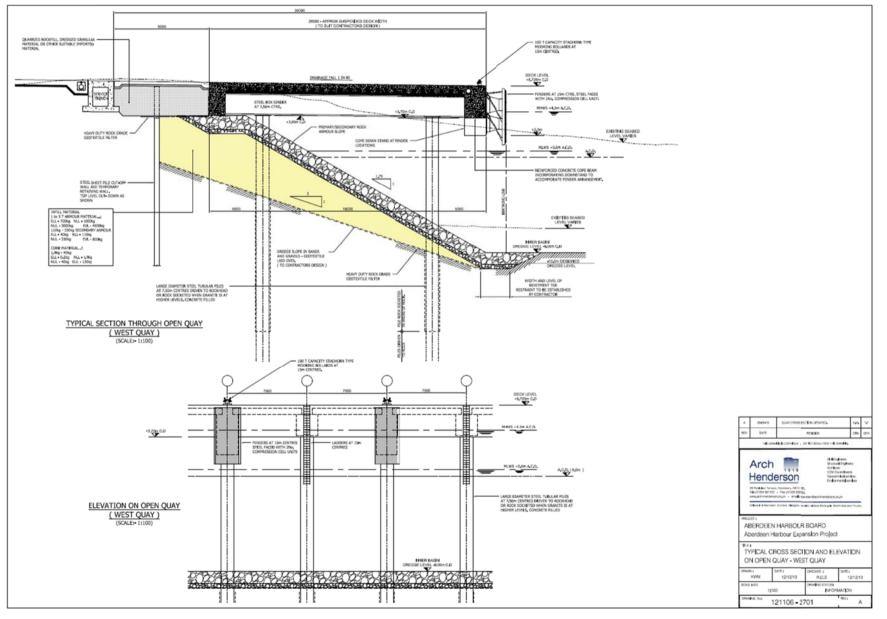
Illustrative cross-section and elevation of a typical section of an open quay – West Quay
